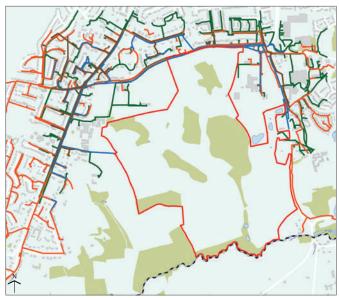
Plan showing existing network of water, gas, electricity and telecom services present around the site
